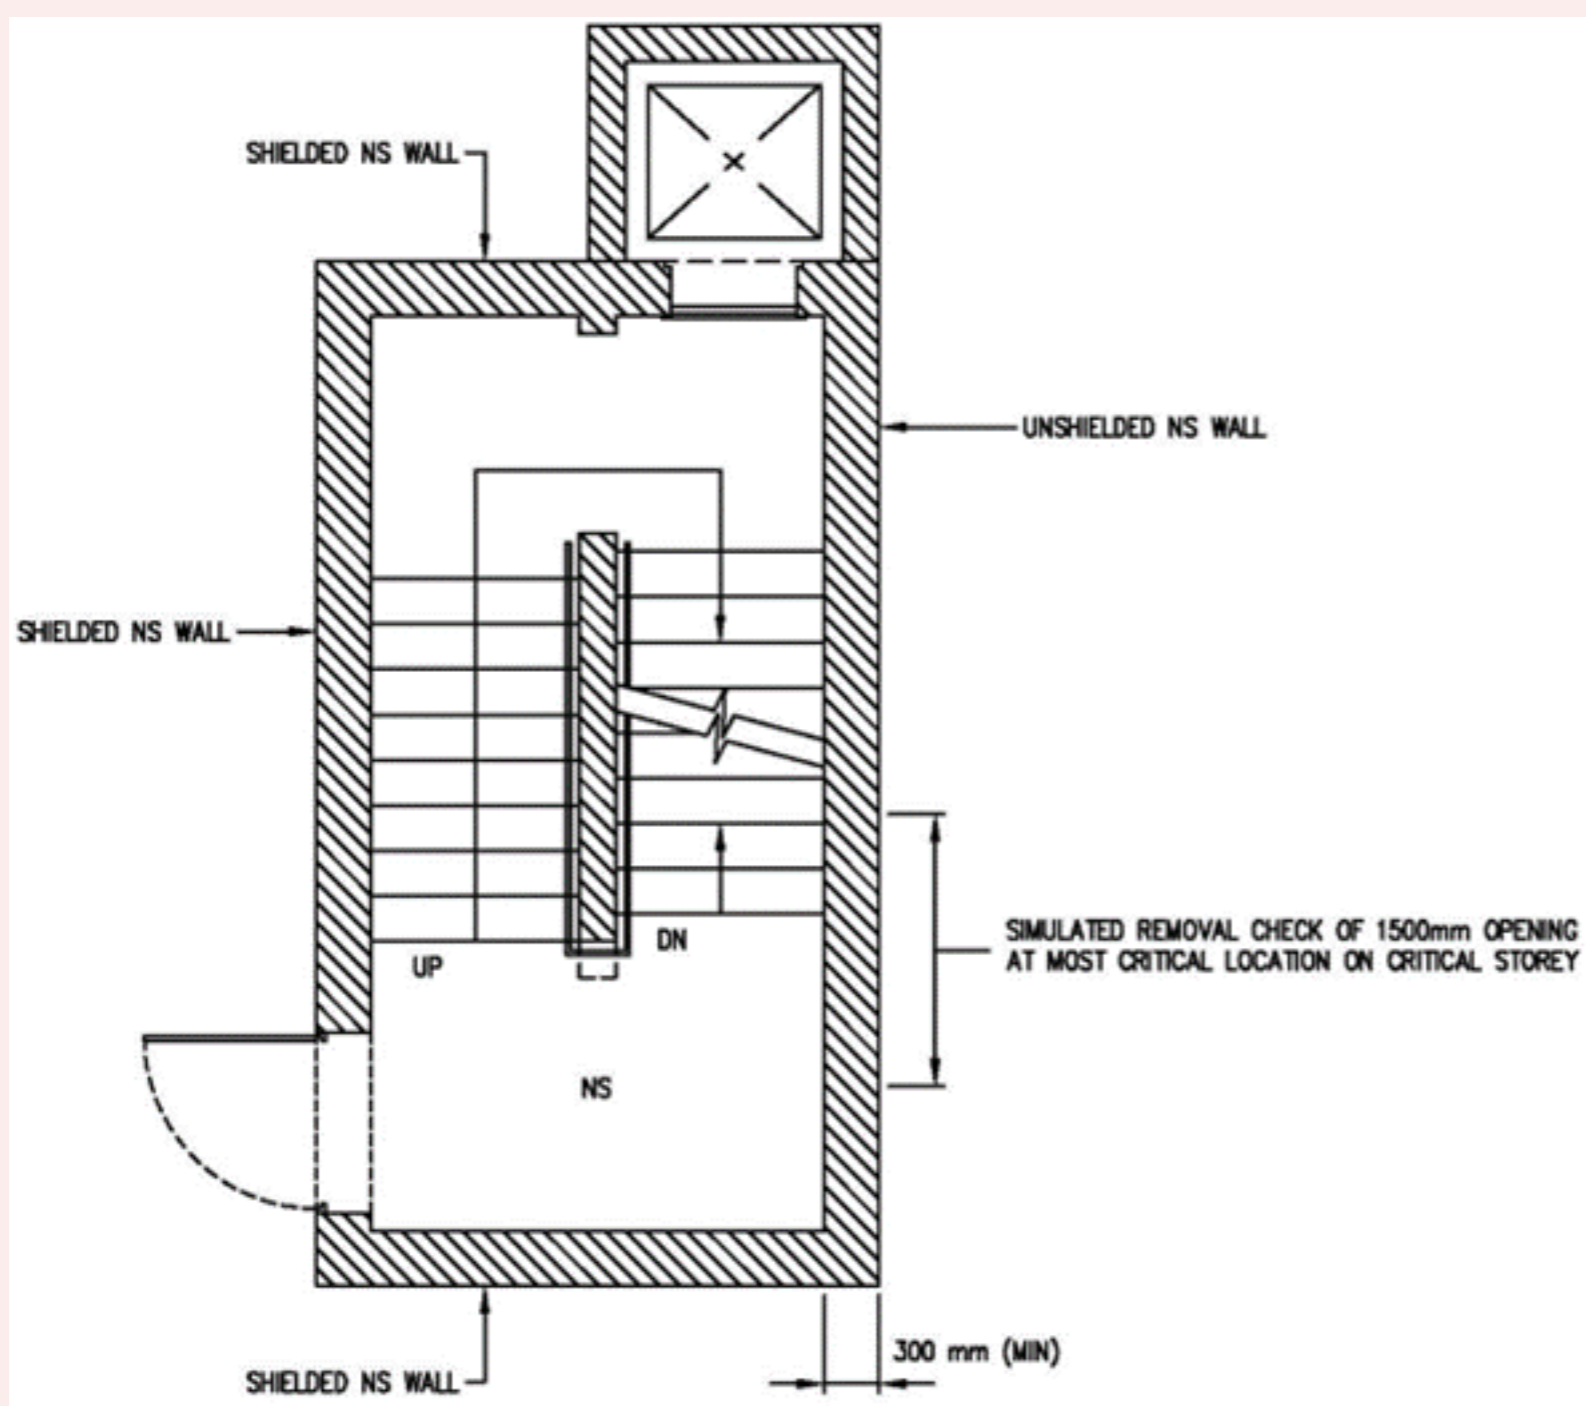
(d): UNSHIELDED NS WALL OF S/C SS TOWER
